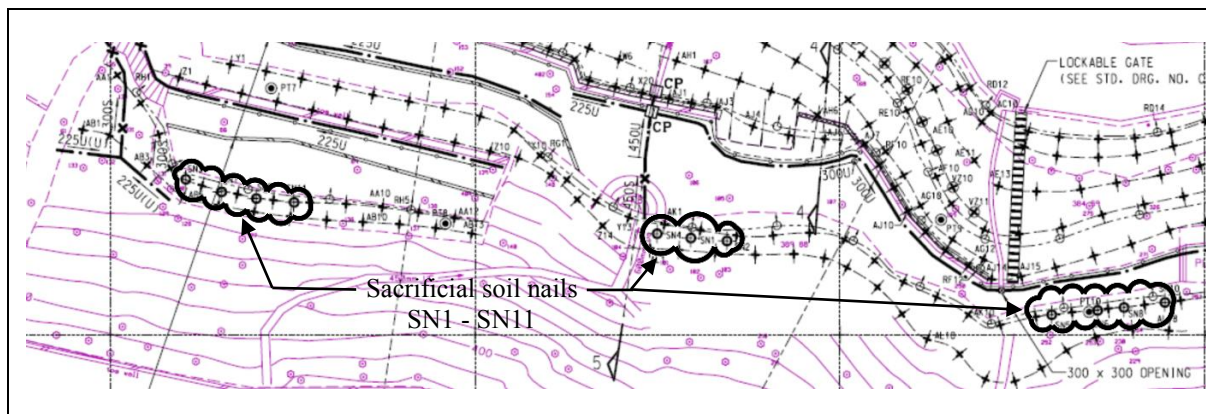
Approximate Locations of Sacrificial Soil Nails at Slope No. 11SW-C/FR83 (sub-division 3) and Slope No. 11SW-C/C839 at Plantation Road
